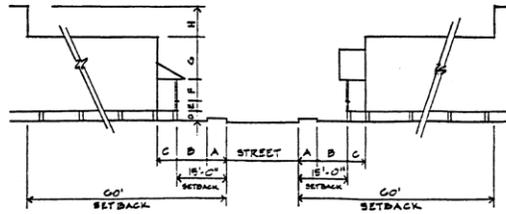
WOOD COTTAGES DISTRICT-STREETSCAPE, TYPE 1
